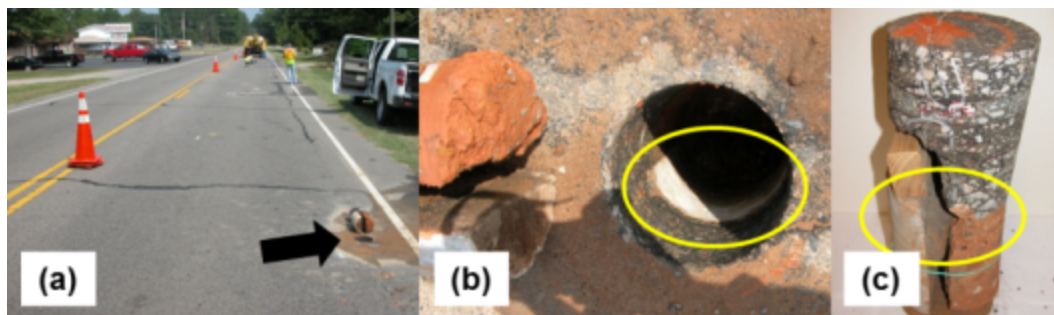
Field core with pavement substructure as evidence of road widening.
